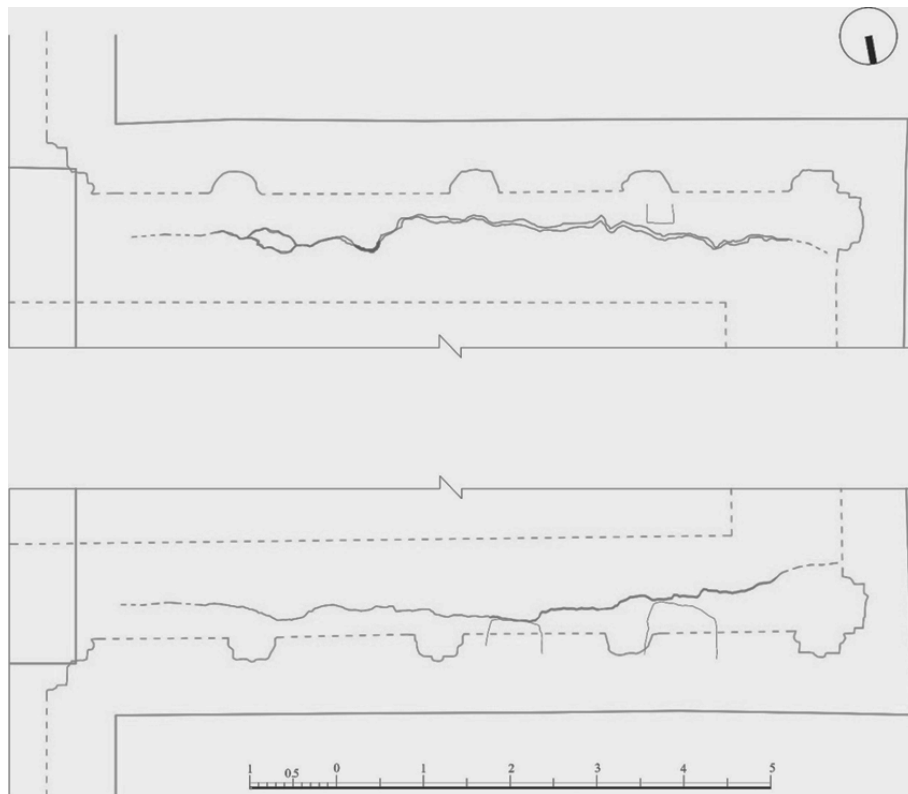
Plan of the course of the longitudinal cracks of the South (top) and North (bottom) wall, (drawing by Architect Lasha Shartava)
